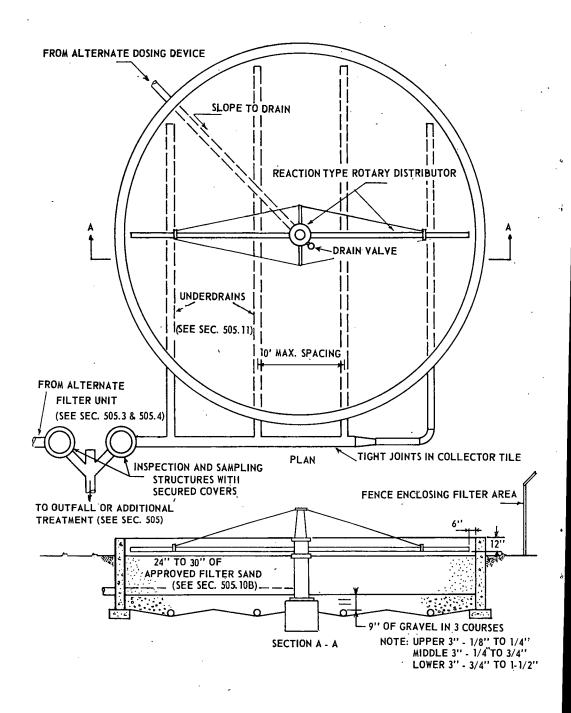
OPEN SAND FILTER WITH ROTARY DISTRIBUTOR
